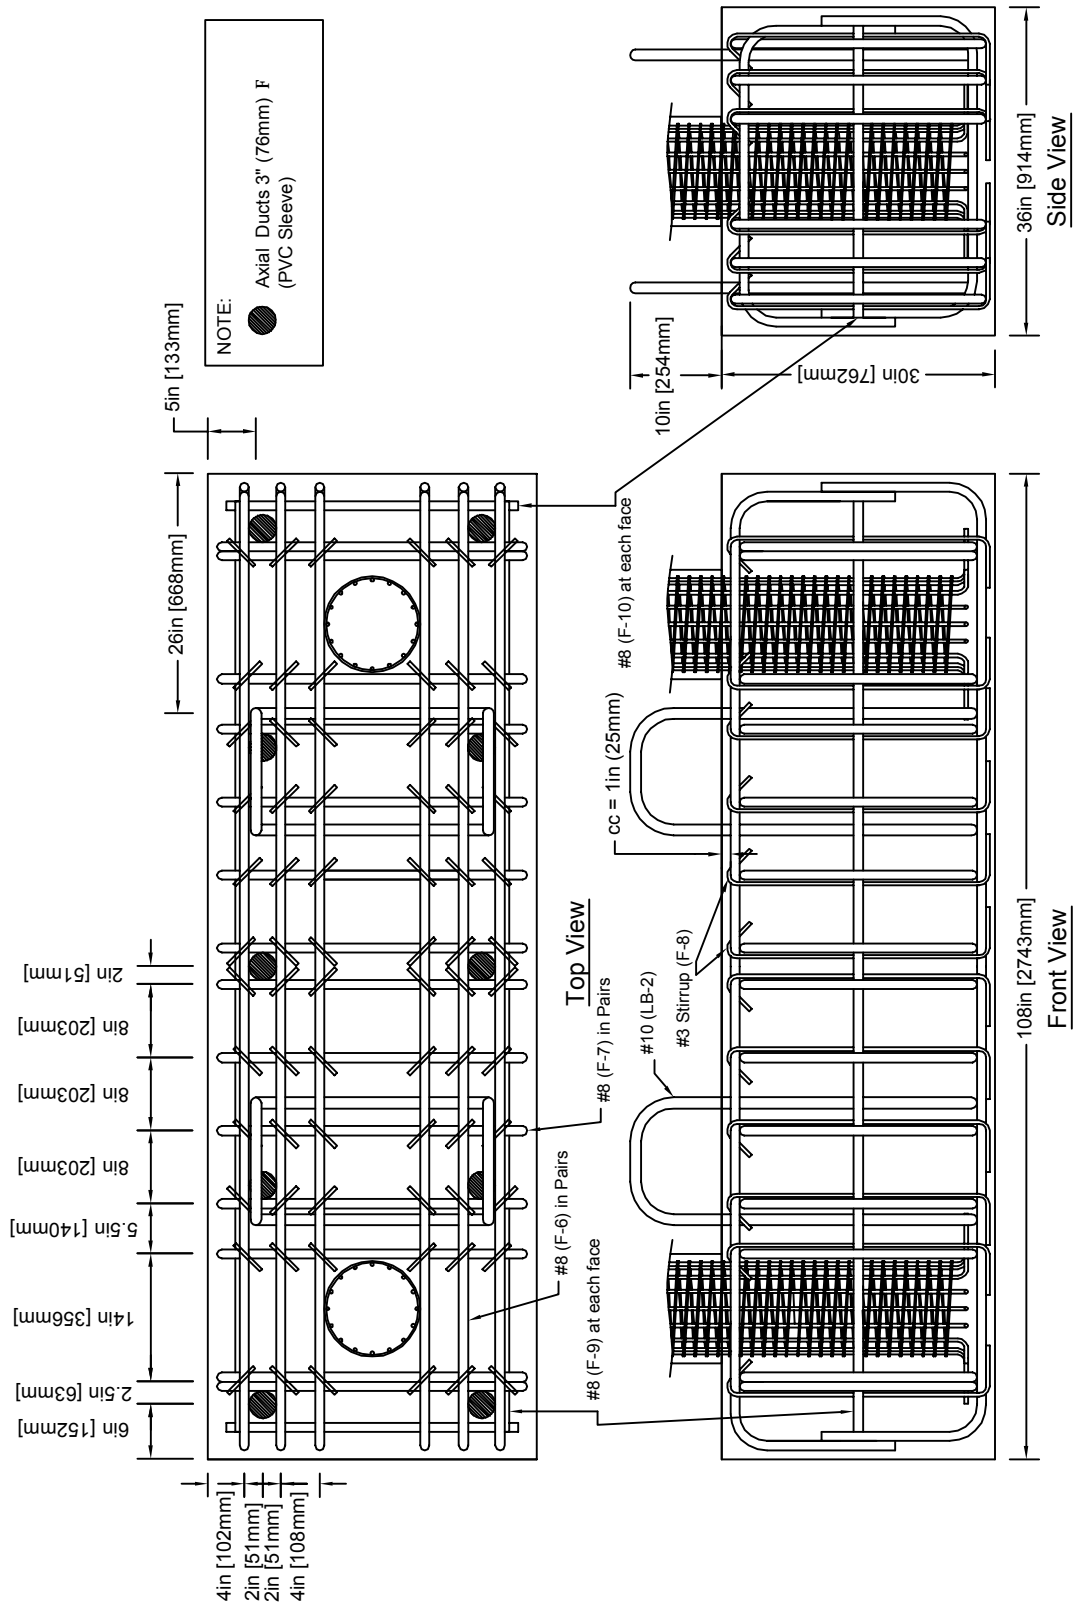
Bridge Plans Sheet 11; Bent 3 Footings.
